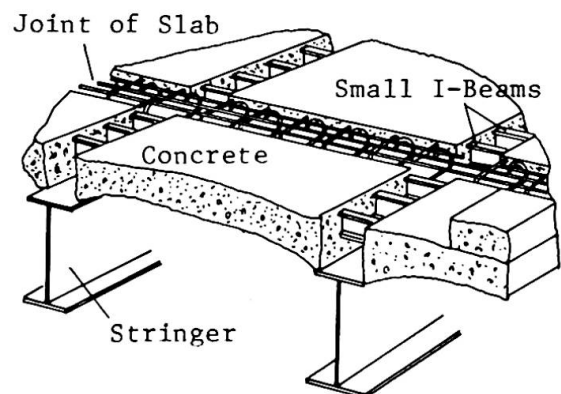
Detail of Precast Concrete Steel Grating Floor
